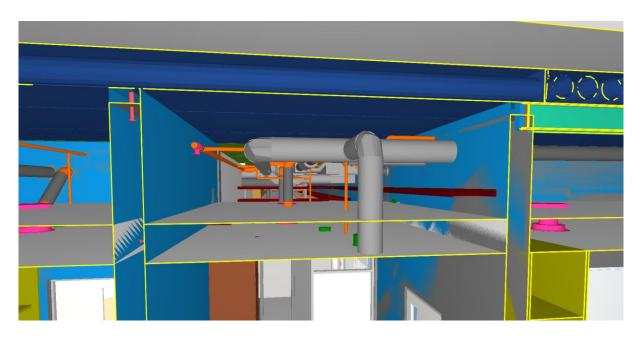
Model section of ceiling details at NPK in MMI 400 (image courtesy of Skanska).
